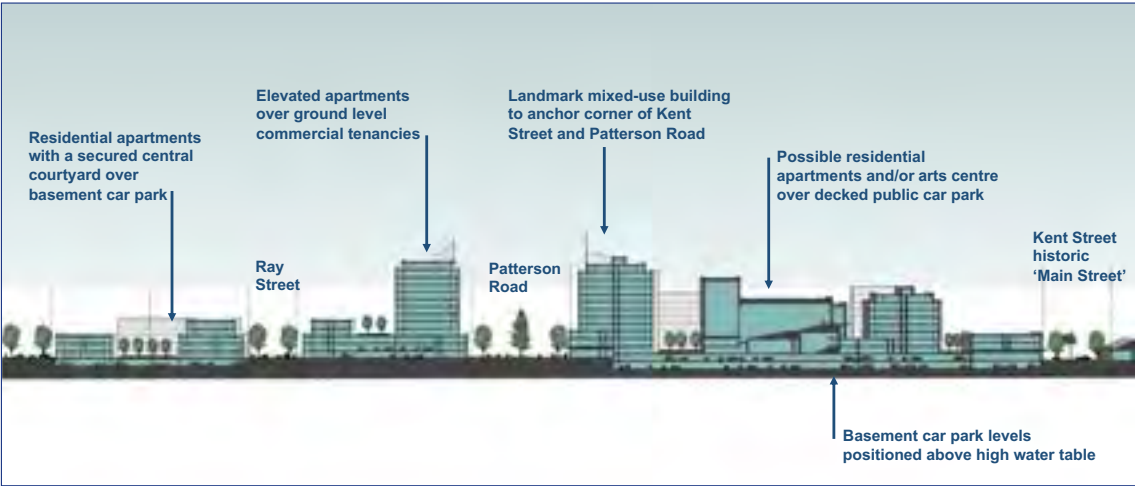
Indicative Development Cross Section - Patterson Road
